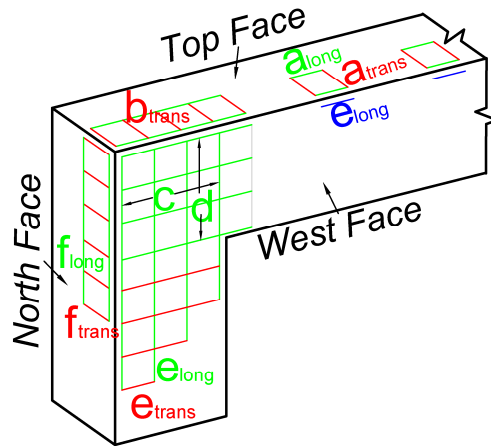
Reinforcement Layout of C-beam Specimen.
